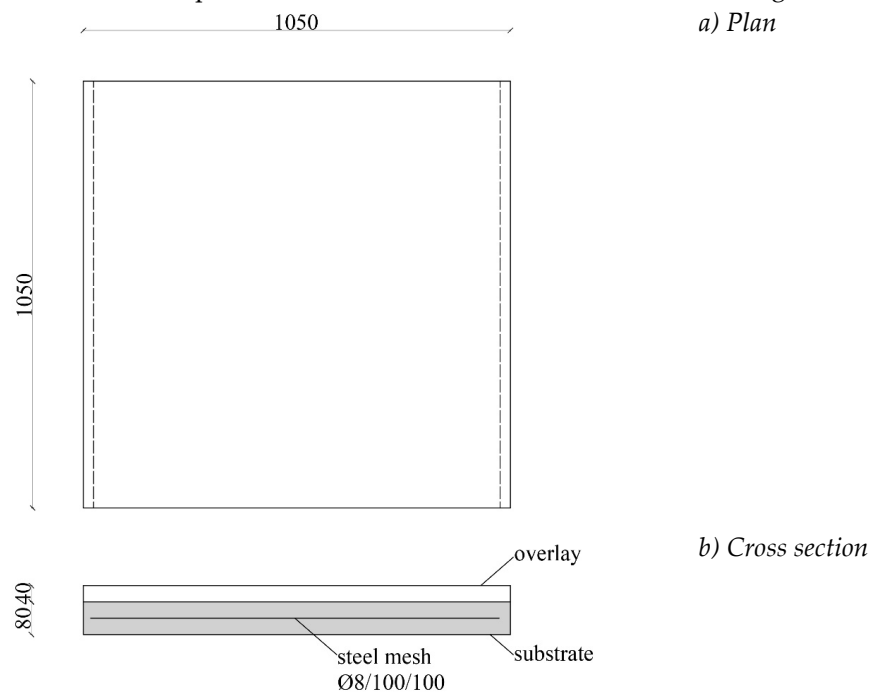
Geometry of specimen: a) plan; b) cross section.
